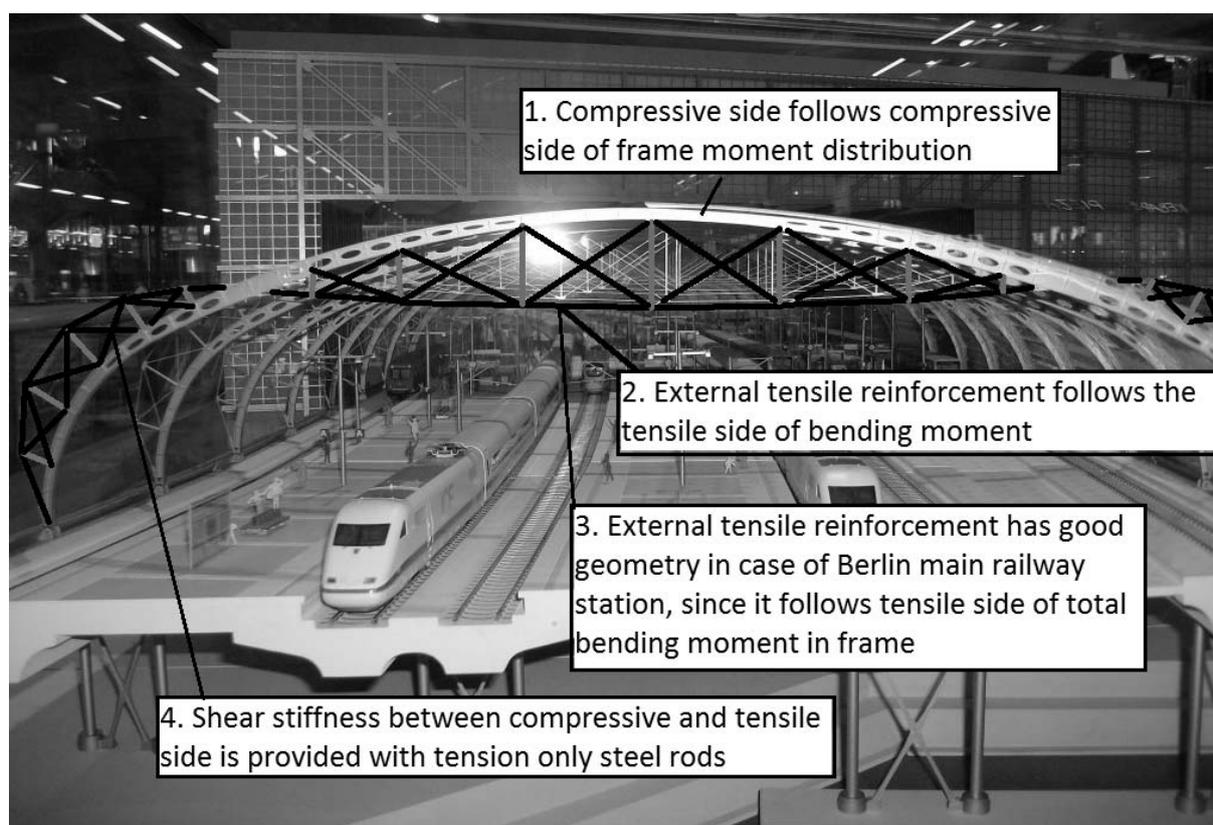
Berlin Main Railway Tensile, compressive and shear struts arrangement.
